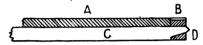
A, BOTTOM BOARD; B, ½-INCH PLATE; C, SILL; D, BACK BAR. SOALE, 1 INCH EQUALS 1 FOOT.
